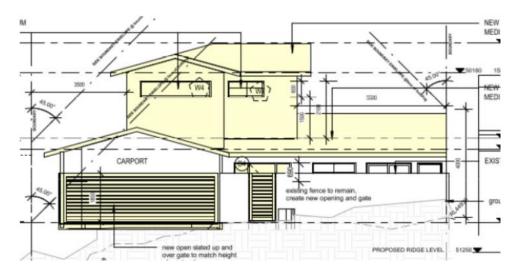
Proposed sliding gates height of 1.8m in height creating a visual "walled in" presentation to Victor Road.
